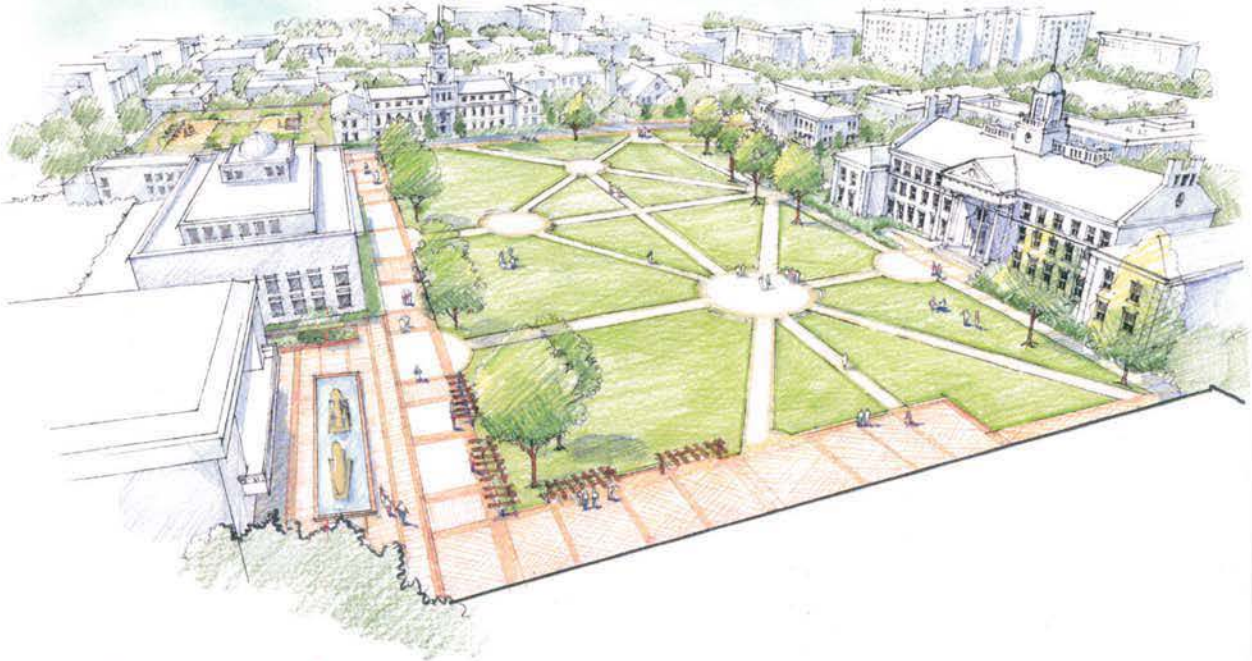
Perspective drawing of proposed Main Quad Renovation
